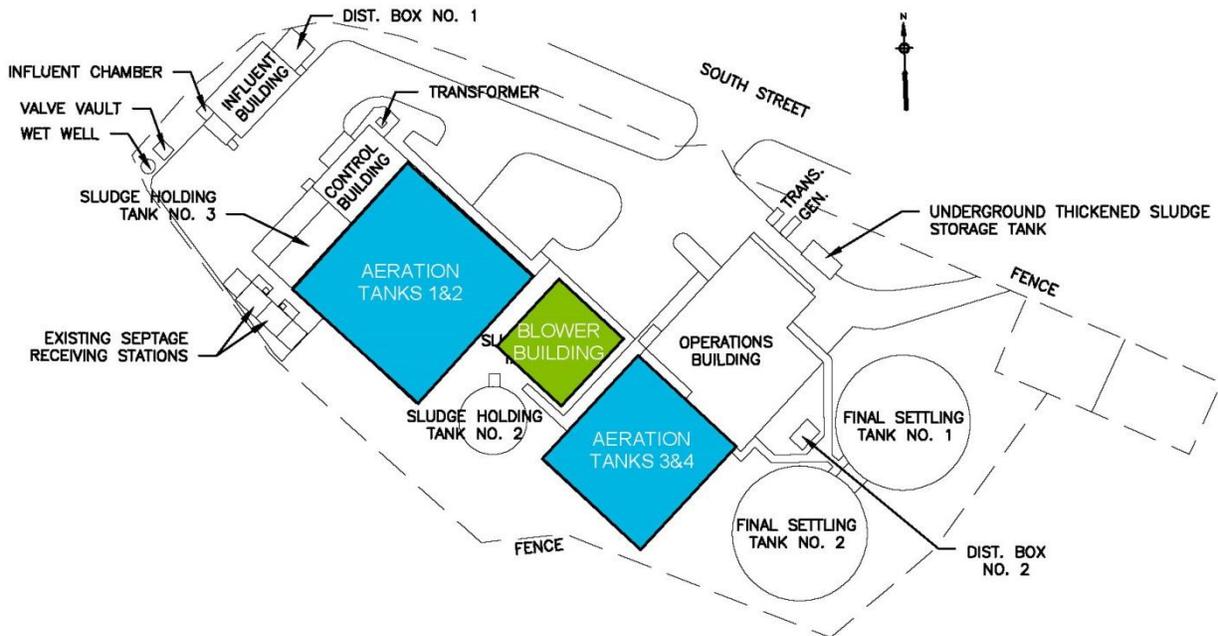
PROPOSED BLOWER BUILDING SITE LOCATION
